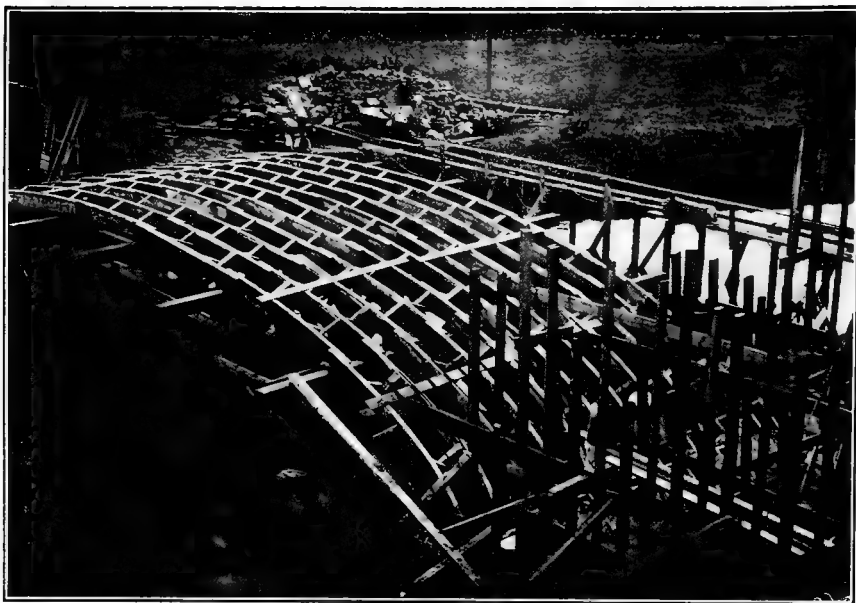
CENTERING OF ARCH BRIDGE, ELM STREET, CONCORD, MASS.
